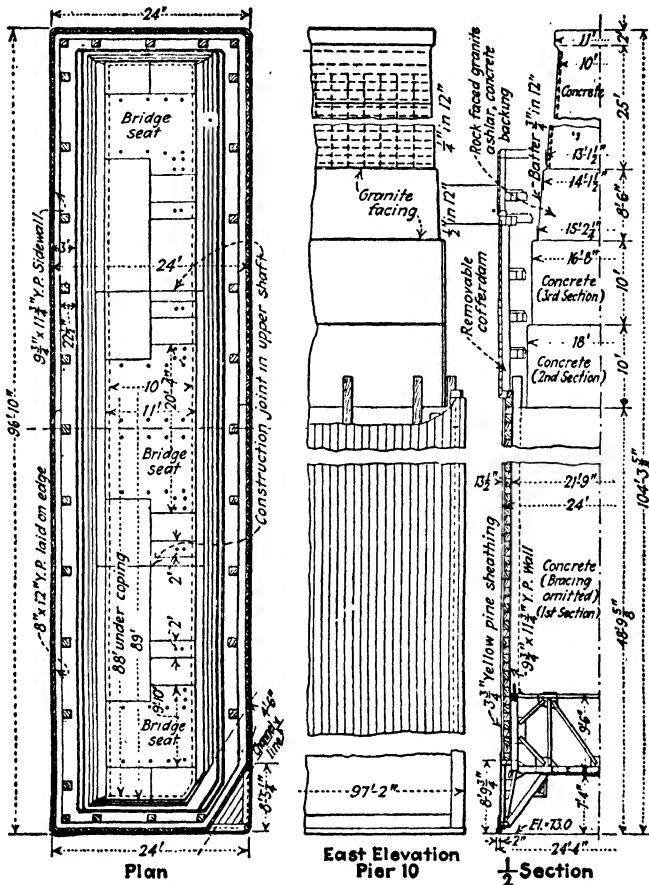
Caisson of Newark Bay Bridge of the Central Railroad of New Jersey.
